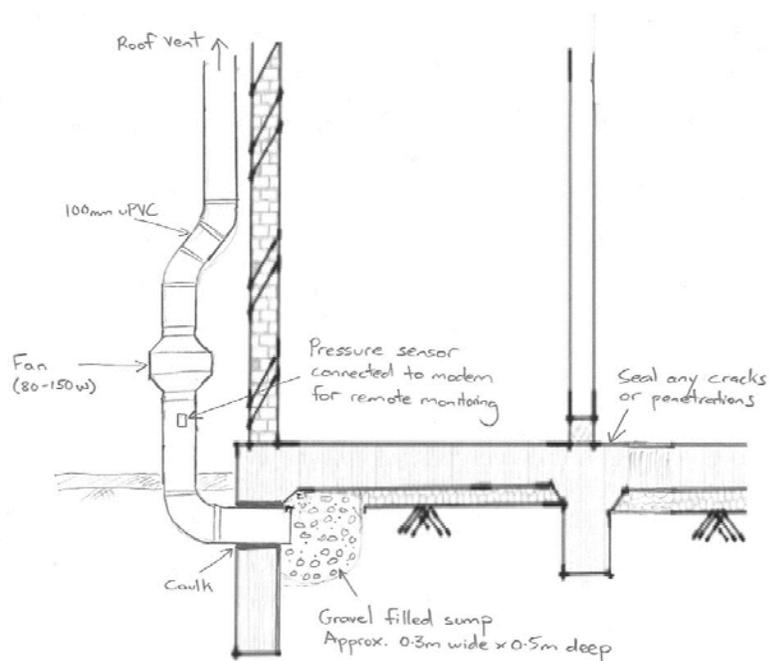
Typical sub-slab depressurisation perimeter sump detail
